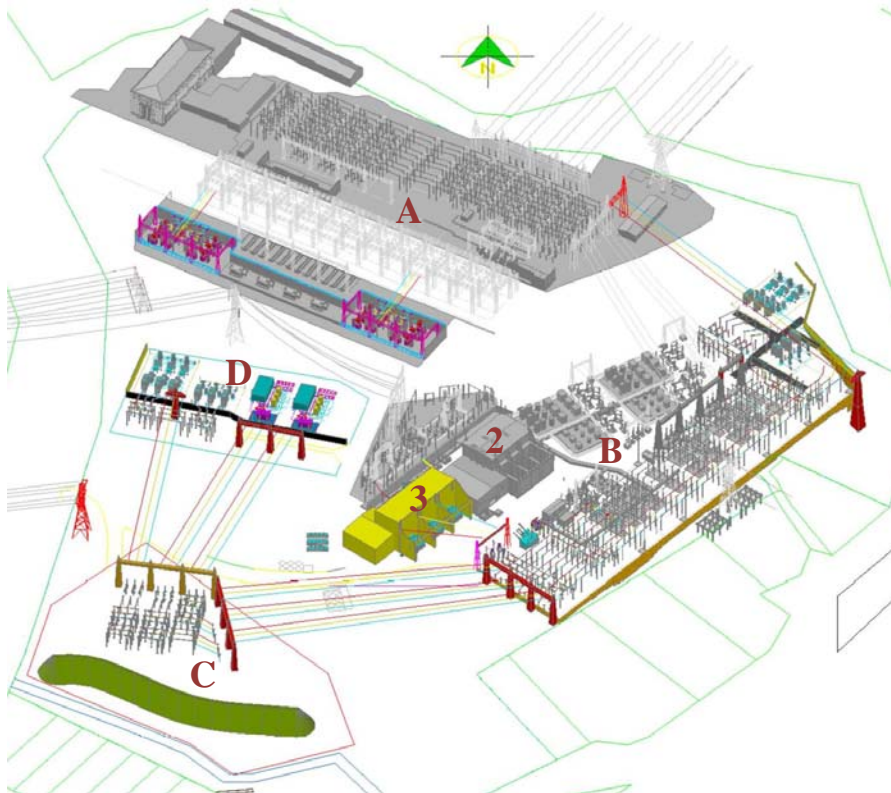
New Site Layout Planned for Haywards (Pole 3 buildings shown in yellow)
